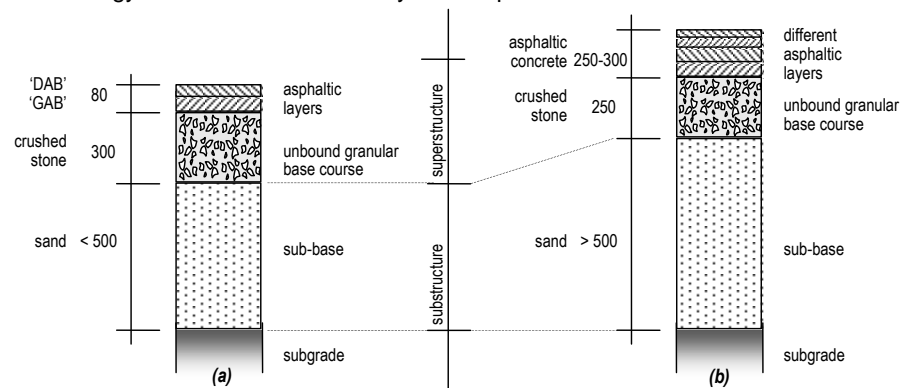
Pavement structure of a secondary road (a) and a motorway (b)
